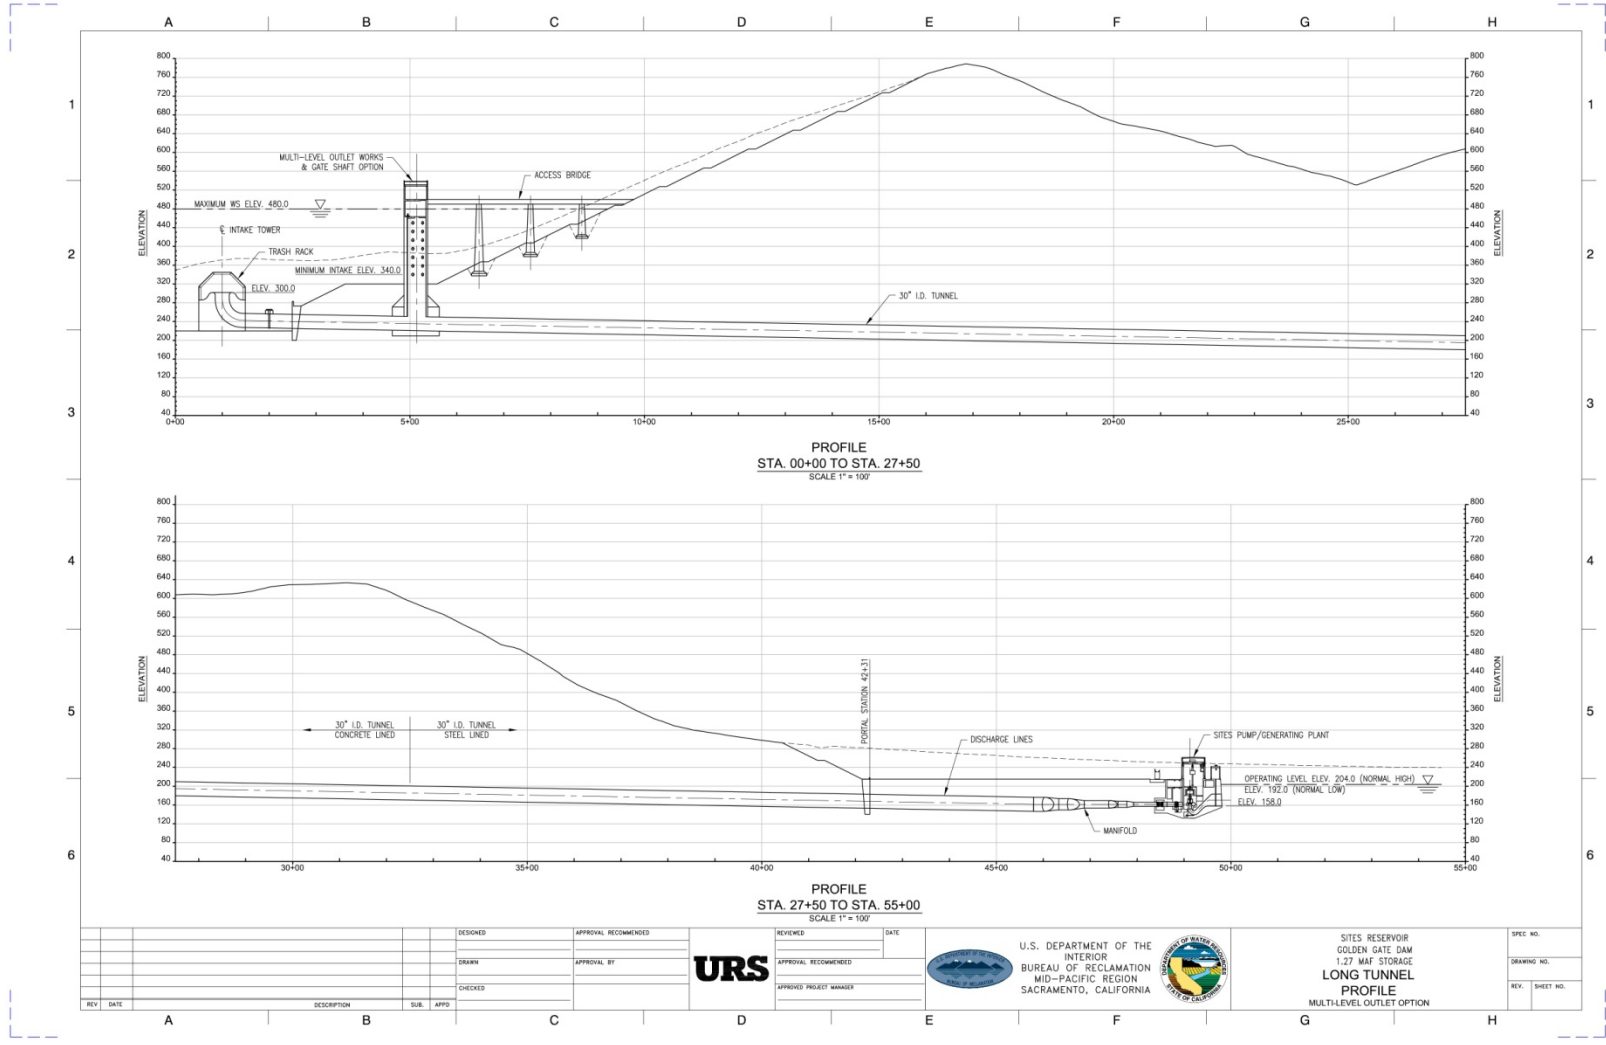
Inlet/Outlet – Profile – 1.3 MAF Reservoir
